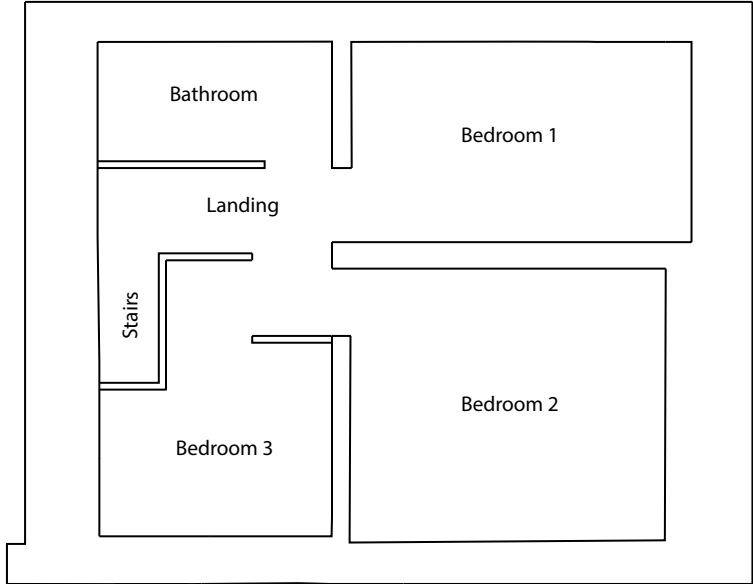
First floor plan of Grundy's Farm, Clover Road, Chorley. Scale 1:100 at A4.
